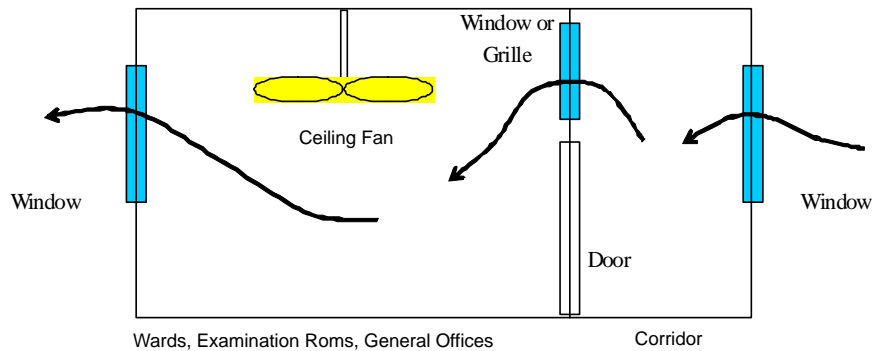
Ventilation System for Wards, Examination Rooms and General Office
